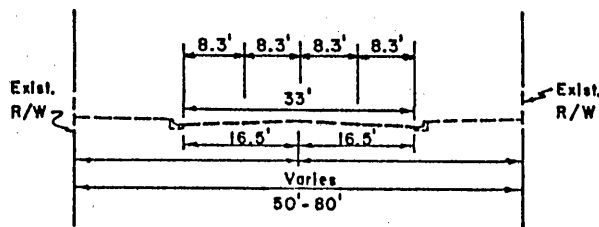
EXISTING TYPICAL SECTIONS
